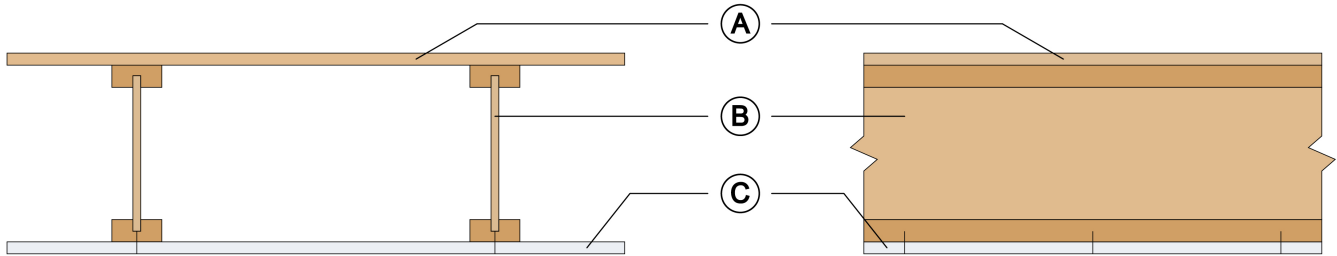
Fire protection of floors FP-01 - fire protection: 12.5 mm (1/2-in.) gypsum board attached to bottom of flange
